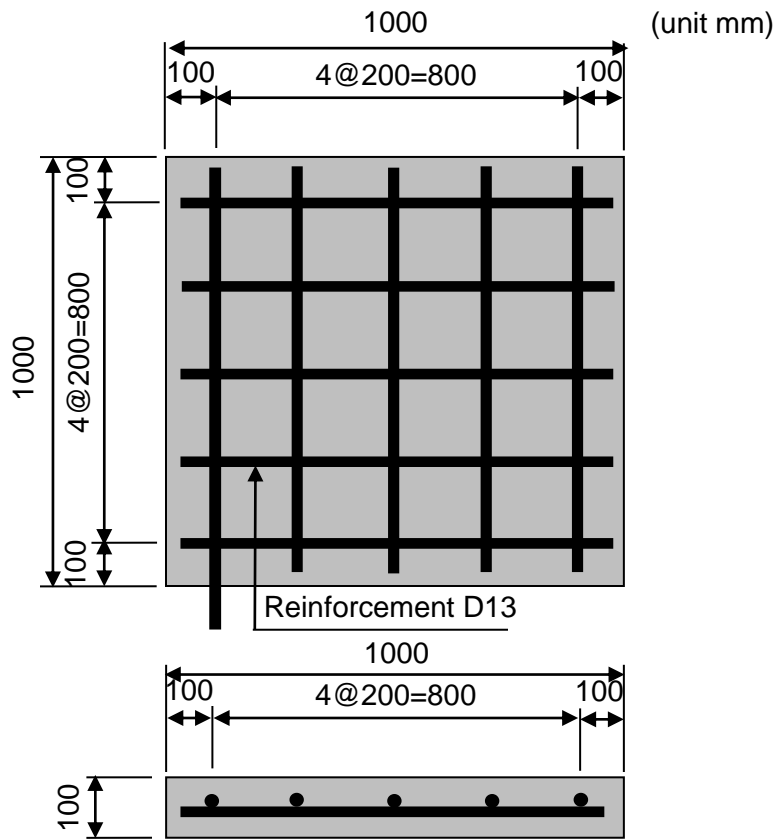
Dimensions of test specimen and arrangement of reinforcement
